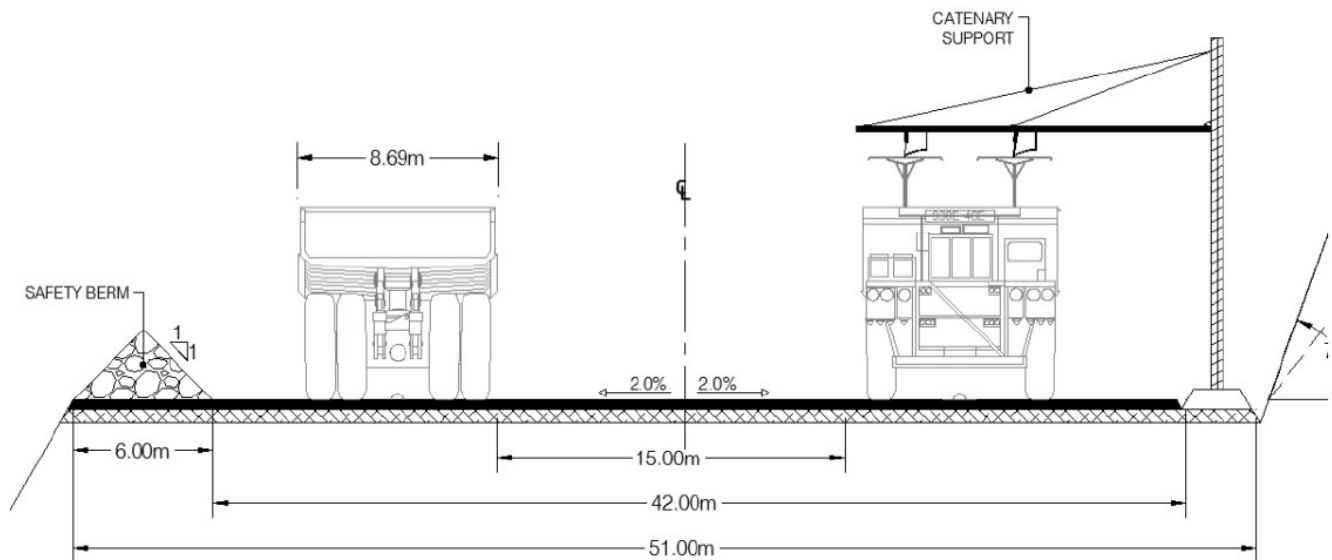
Haulage road construction incorporating a trolley assist system (Janusauskas et al., 2014)
